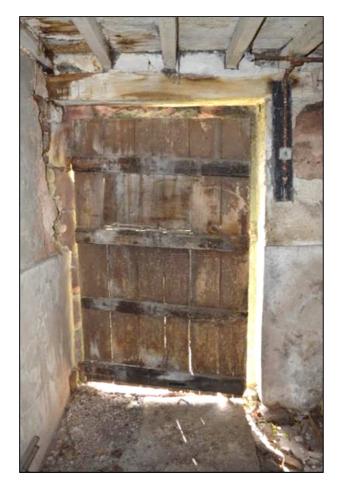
(Shot 131): Interior of ground floor Room 1c, animal accommodation, east doorway of south gable end of barn, looking south
